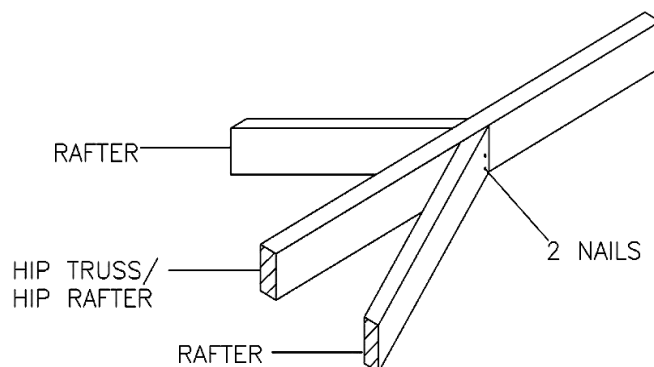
Rafter/Jack Truss Shorter Than 1800mm
